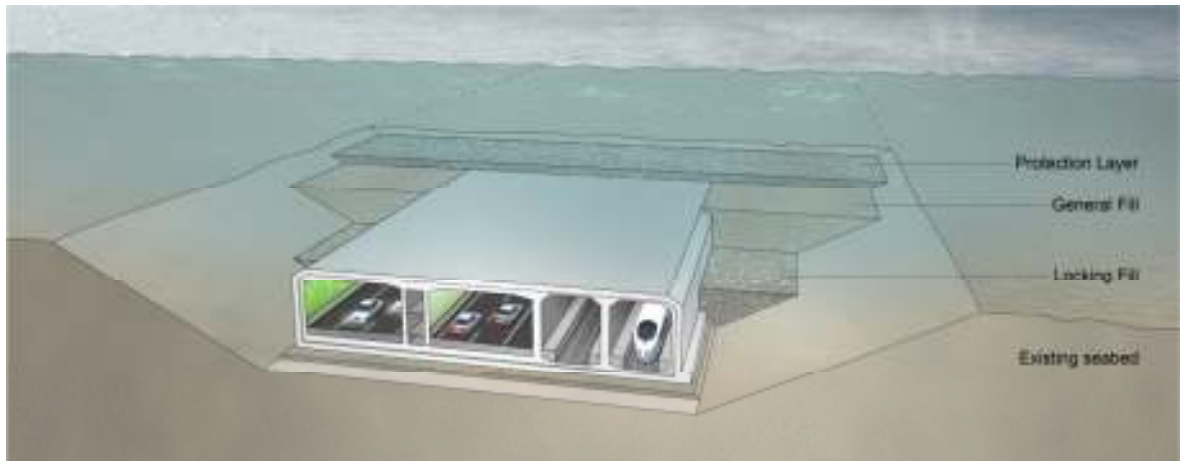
Cross section of dredged trench with tunnel element and backfilling.
